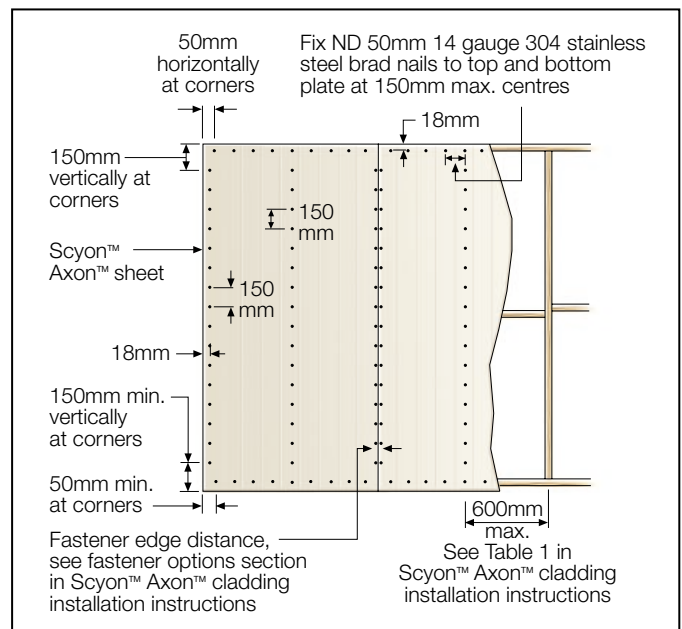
FIXING METHOD 2 FASTENER LAYOUT
